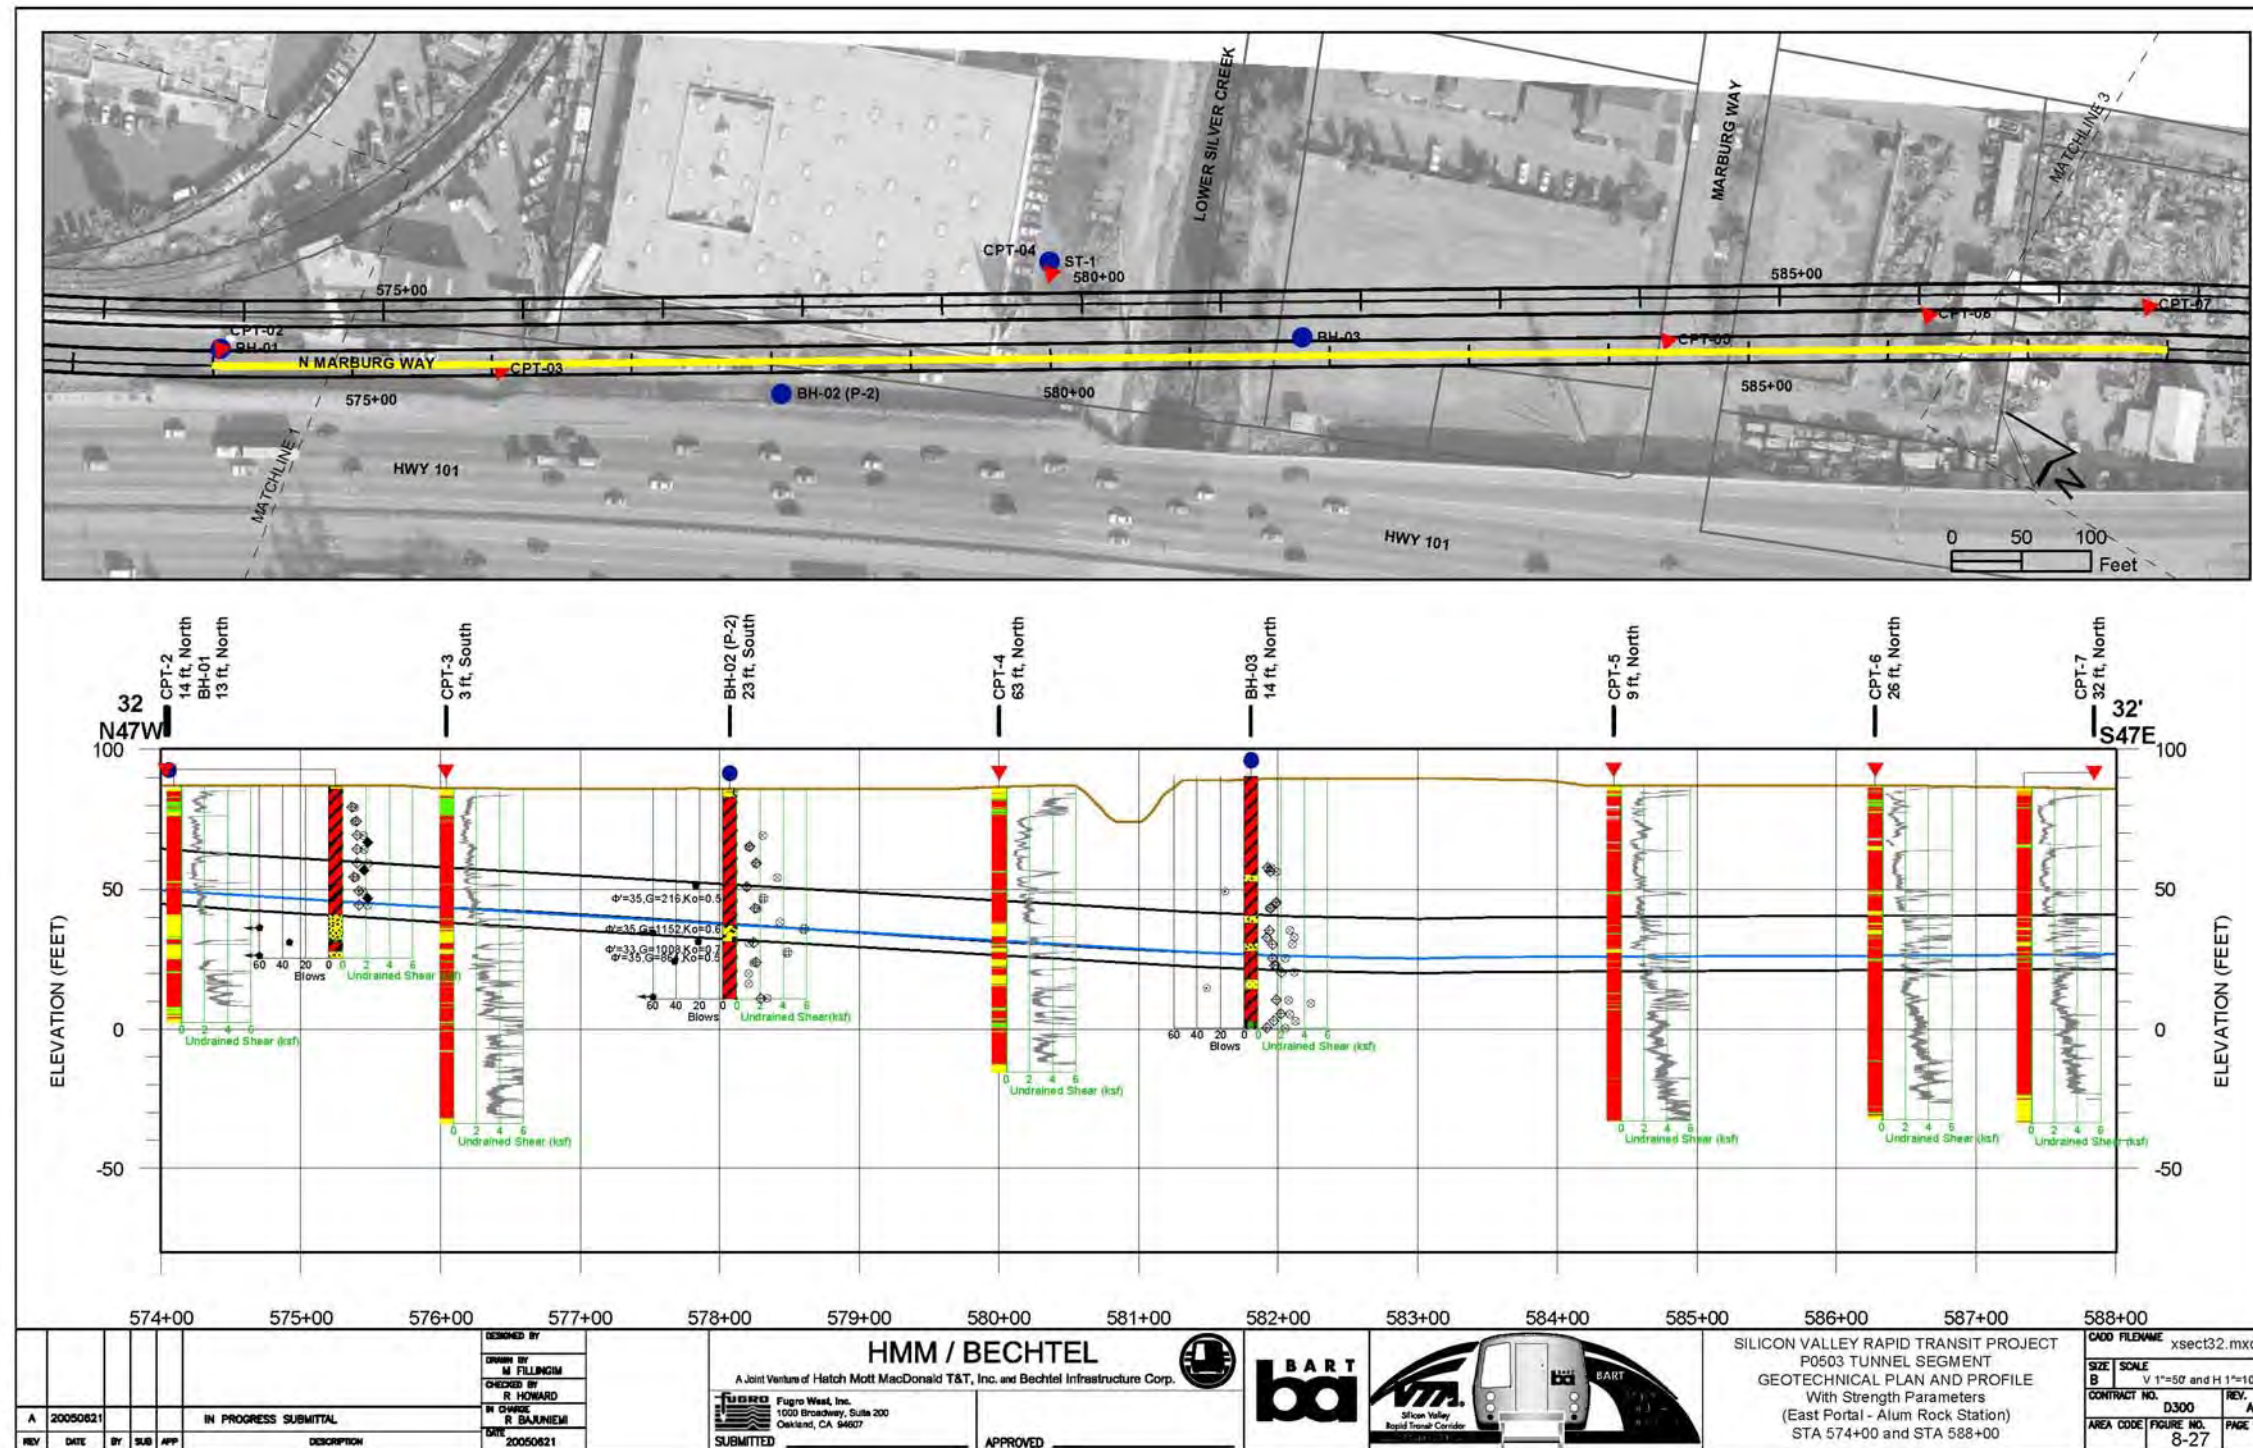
Geotechnical Plan and Profile with Strength Parameters: 574+00 to 588+00.
